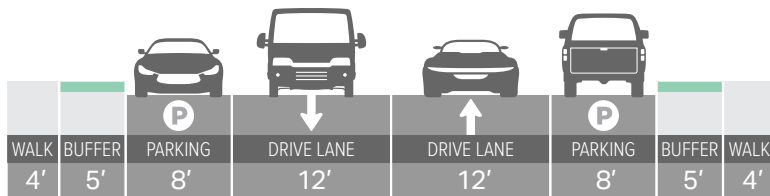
Existing Cross-Section Dart Street to Winter Street
